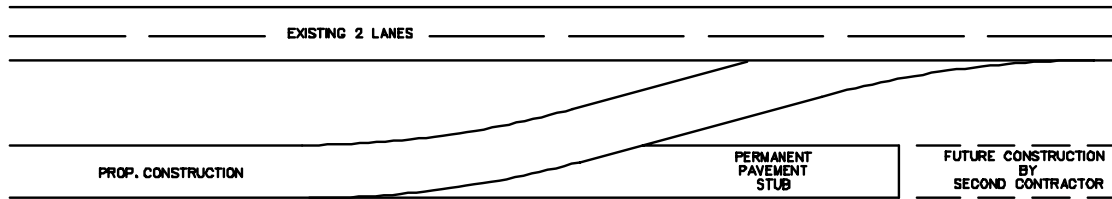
D – 7 SUGGESTED PAVEMENT STUBBING TREATMENT
